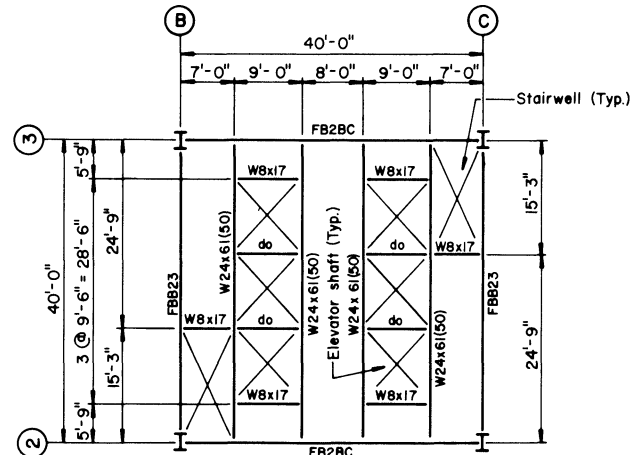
Rigid frame 20-story building—core framing (floors 2-20)
